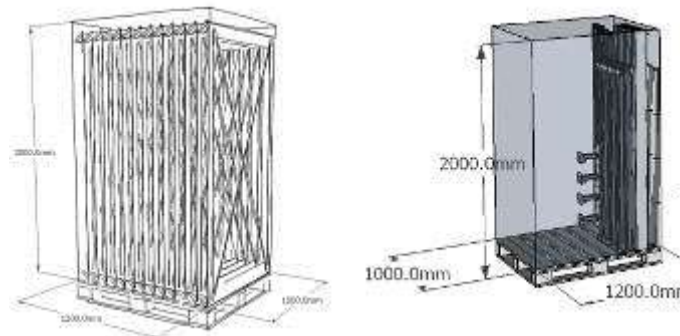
Sketches of the expected package sizes of preassembled 2D elements (left) and individual 1D parts (right).
